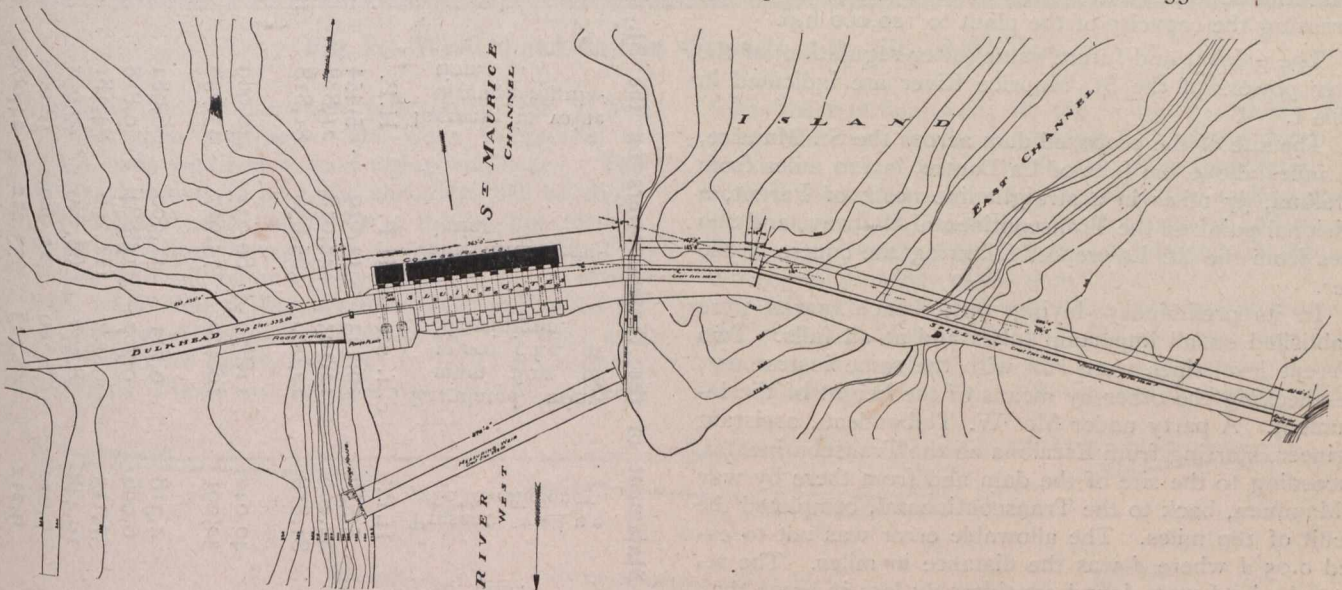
Plan of the Proposed Dam on the St. Maurice River.
